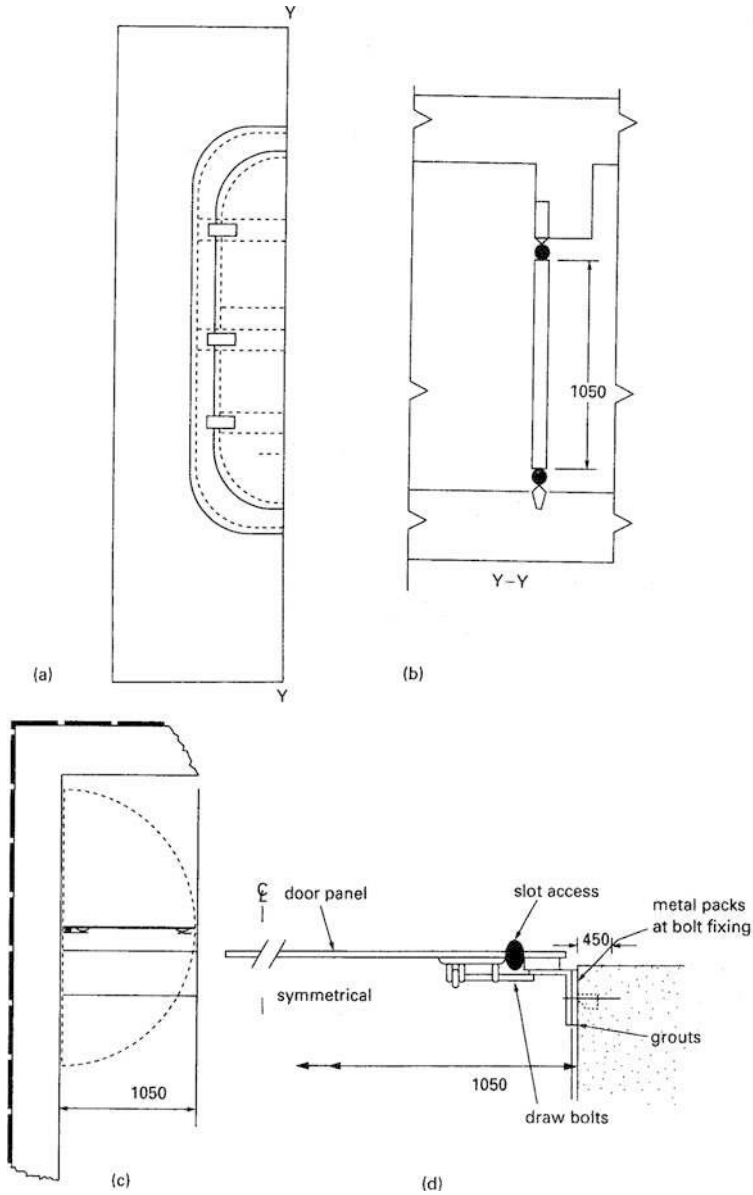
Design of steel blast doors. (a) Elevation; (b) vertical section; (c) door location; (d) horizontal section: structural details
